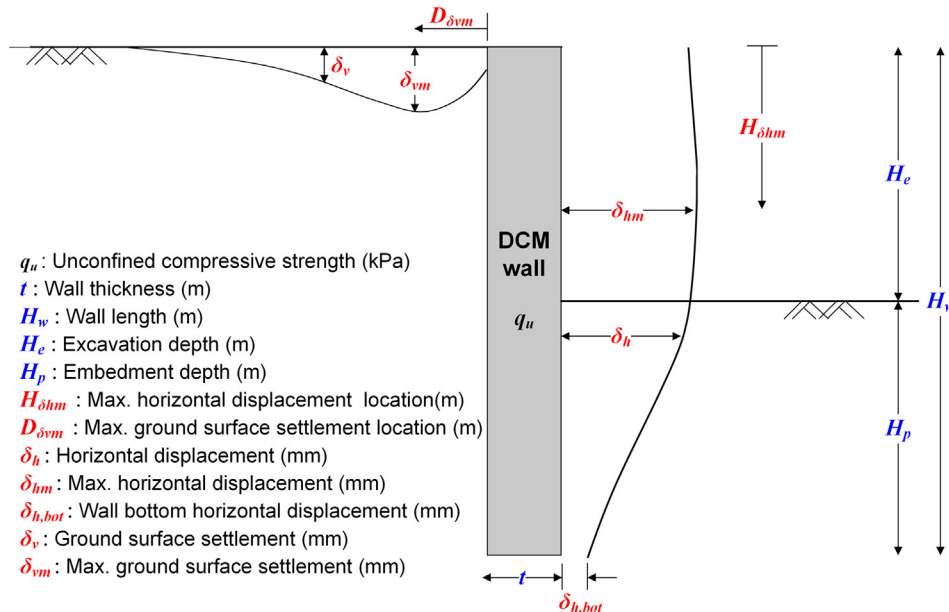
Schematic of an unbraced-unreinforced DCM wall system and notations.
